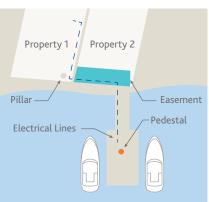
Example electrical details for two berth jetty not located at the property boundary or on a beach
